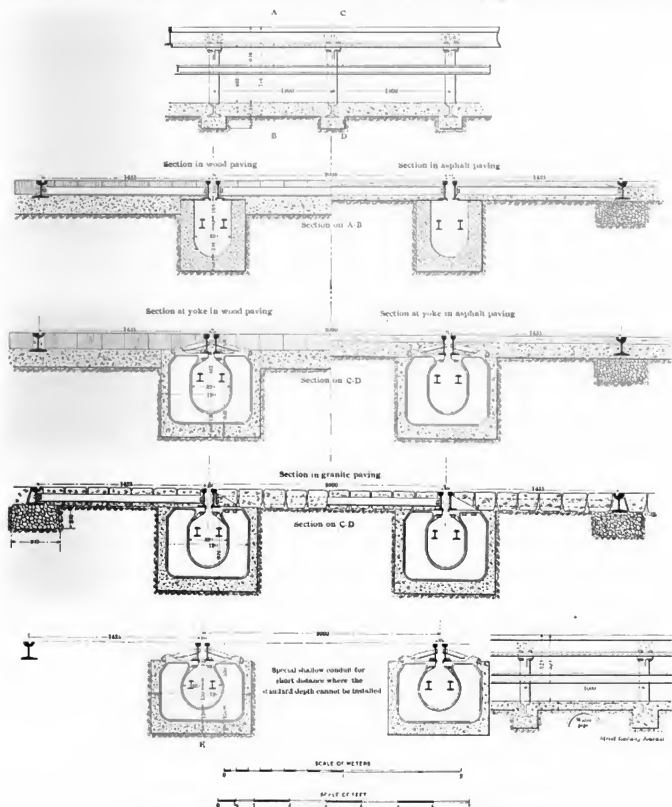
SECTIONS SHOWING STANDARD CONDUIT CONSTRUCTION USED IN BRUSSELS
